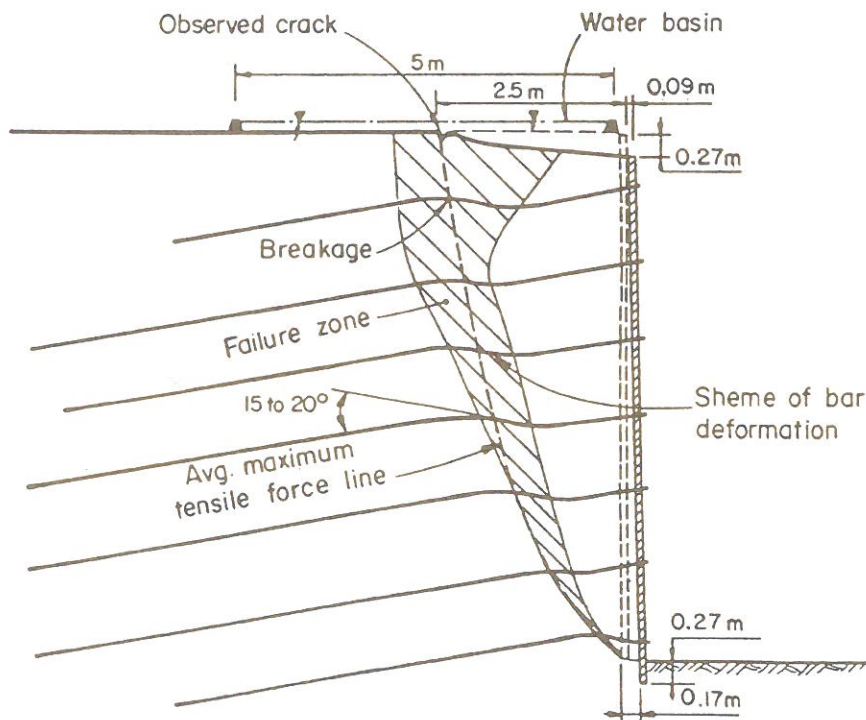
First Clouterre full scale experiment at failure of a soil nailed retaining wall
